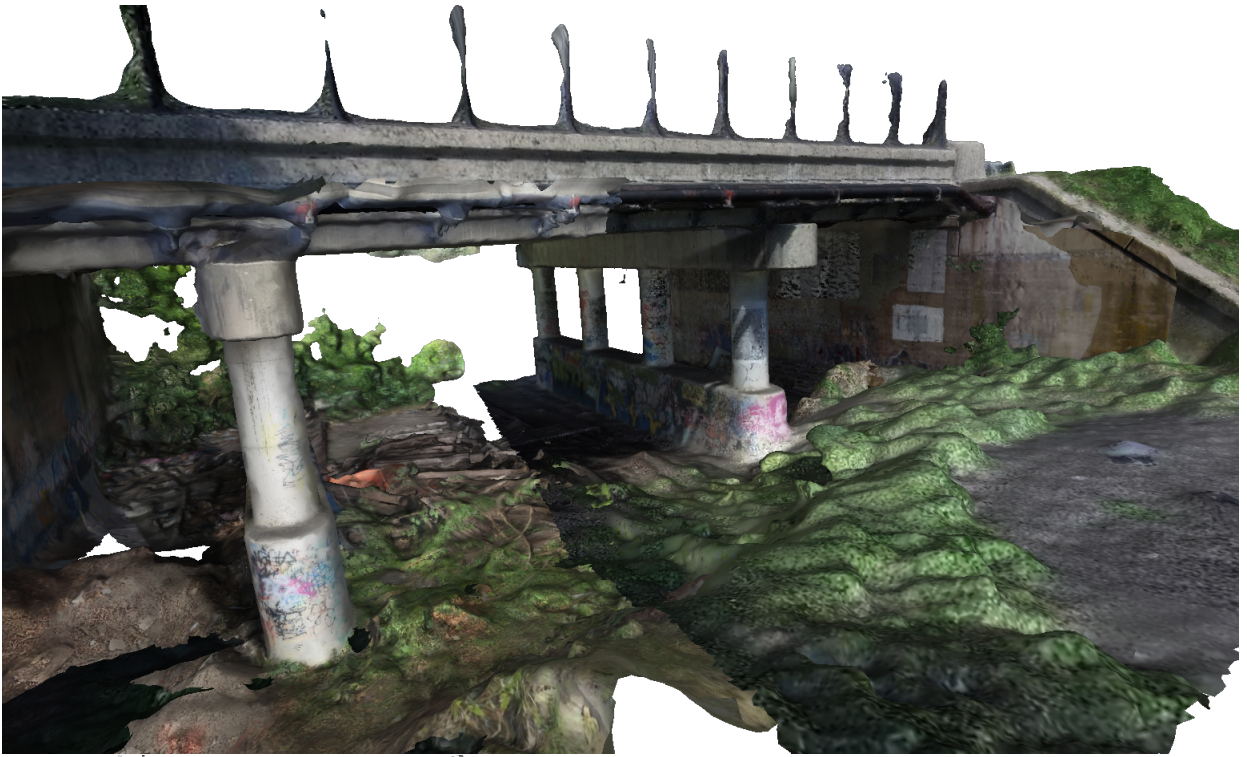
Plain Street bridge, Lowell MA. visual inspection model
